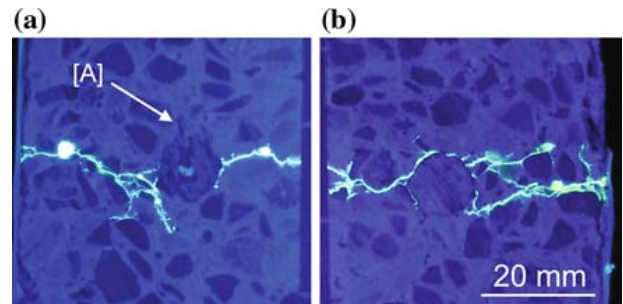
Transverse sections from the a instrumented rebar and b standard rebar. Sections were located ~ 5 mm from primary crack. [A] indicates the location of a sensor
